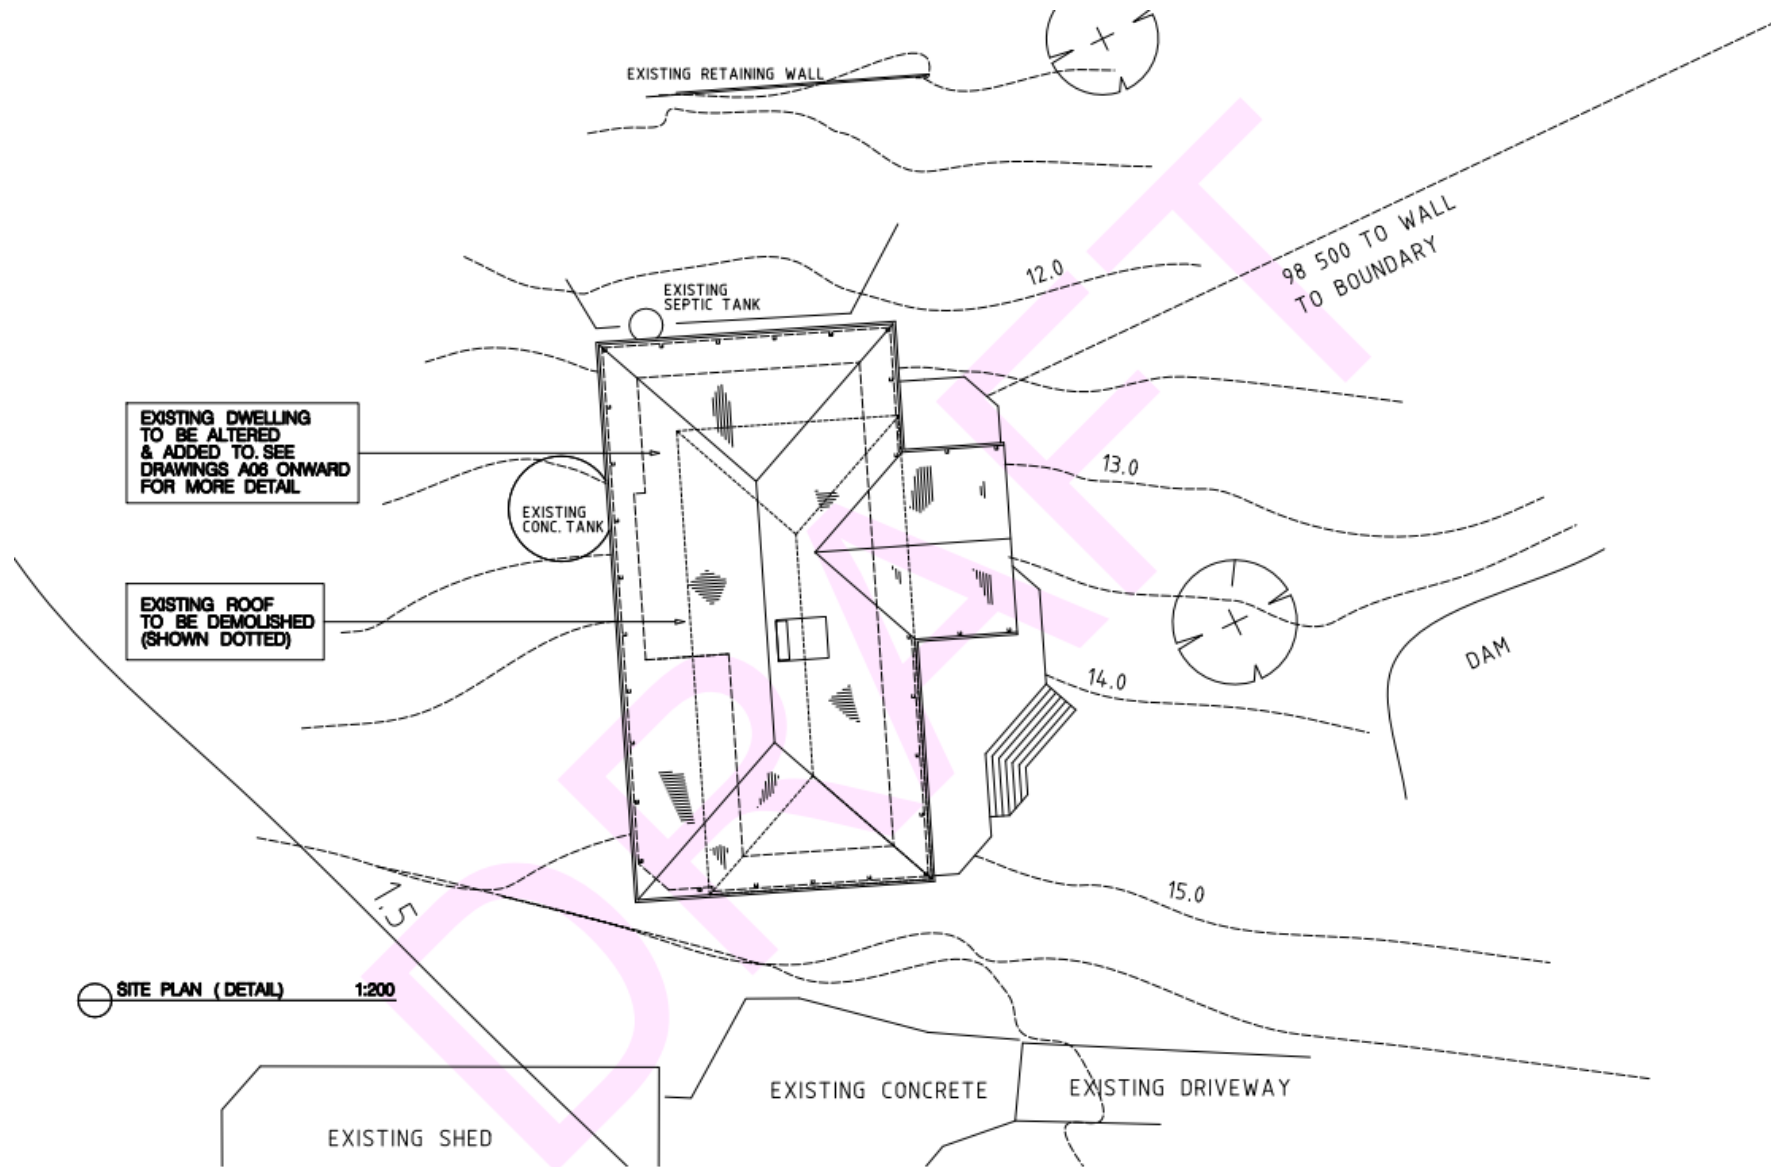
Site Plan Extract (Efficio Projects, 2024). North approx to right of page.
